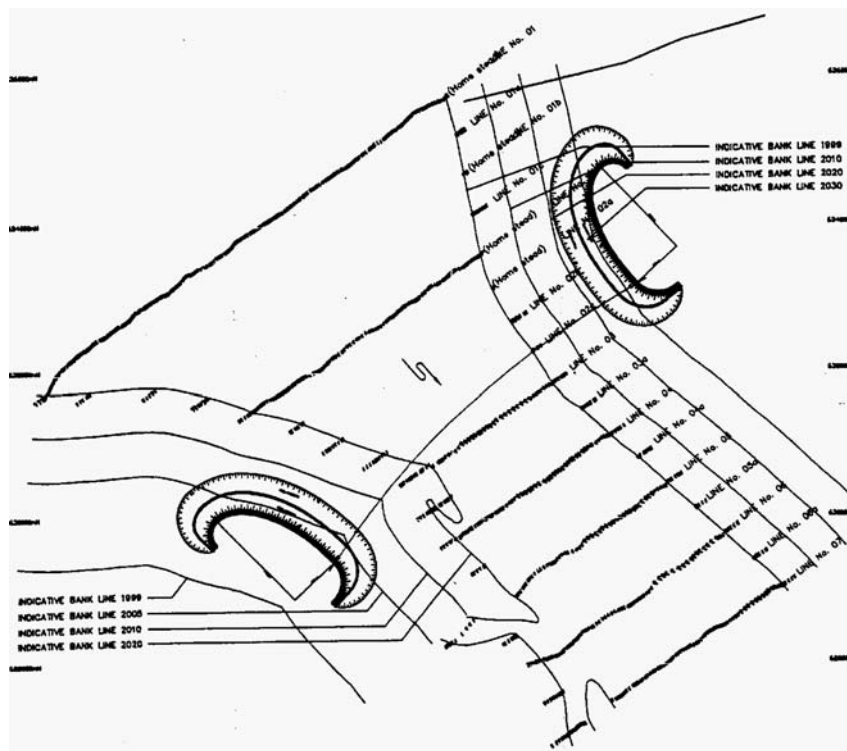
Layout of Guide Bund: Padma Bridge at Goalundo (Pre-F/S)
